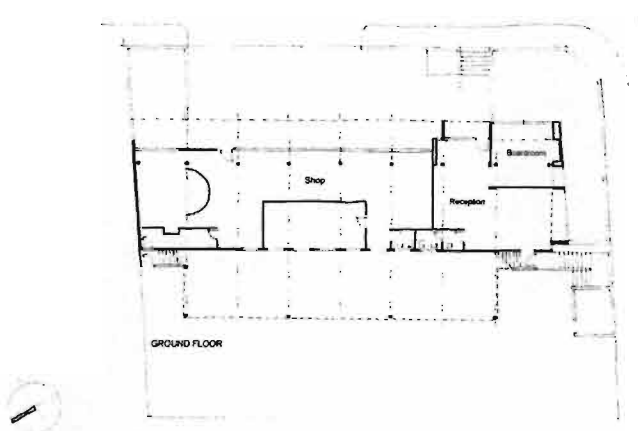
BDG. Julia Road offices. 1973. Plans
